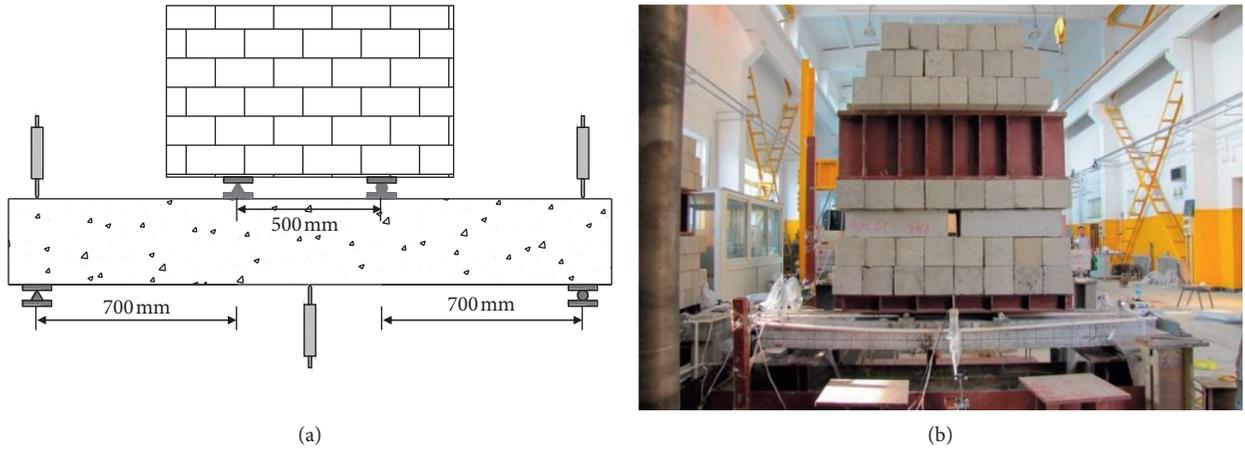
Schematic of the sustained loading test setup. (a) Sketch of loading test equipment. (b) Loading test equipment.
